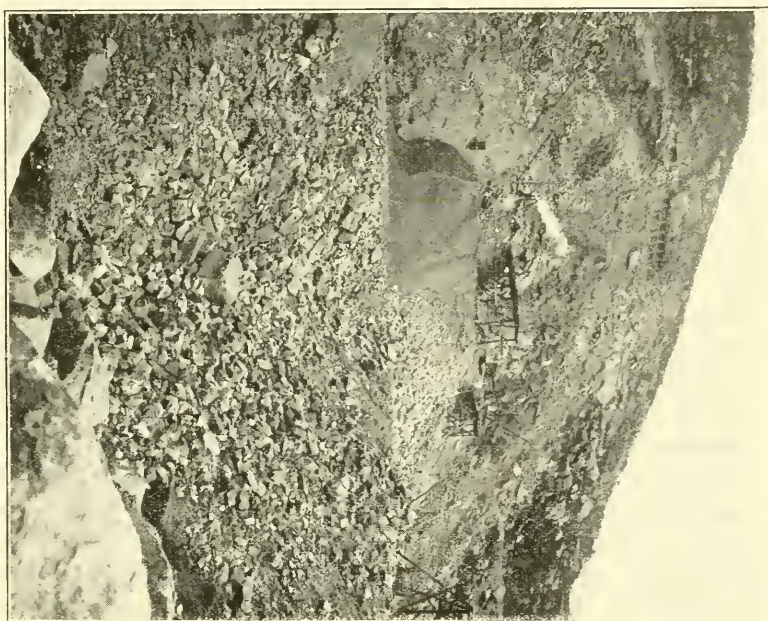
MORENA ROCK FILL DAM, SHOWING LOOSE ROCK ON LOWER SLOPE, AND QUARRY REVERSE WASTED OUTSIDE THE DAM SECTION.
